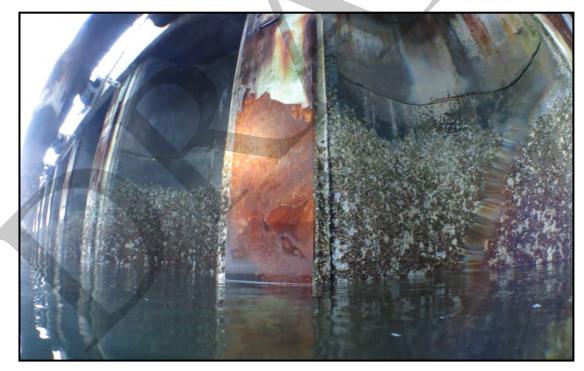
Coating loss and corrosion on steel king pile at Pier 1.
